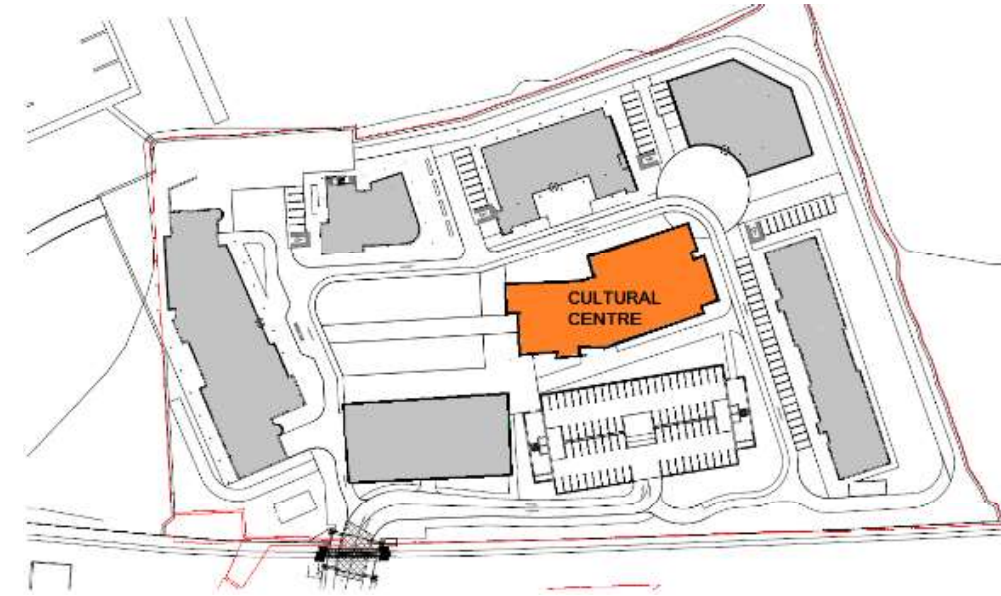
Site Key Plan Indicating the Cultural Centre Building Location
